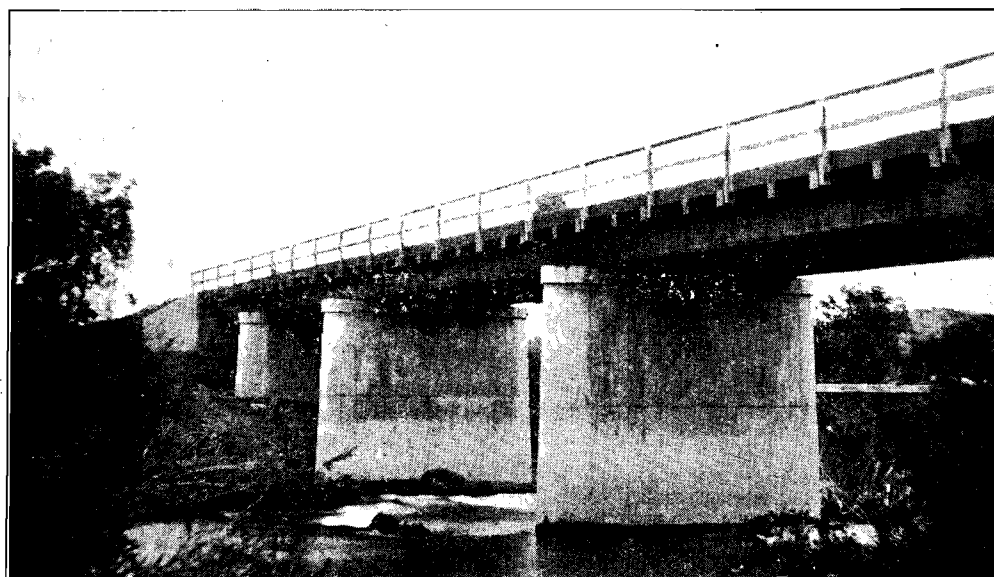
A.—New bridge (Devlin's) on the Glenburn Road.
